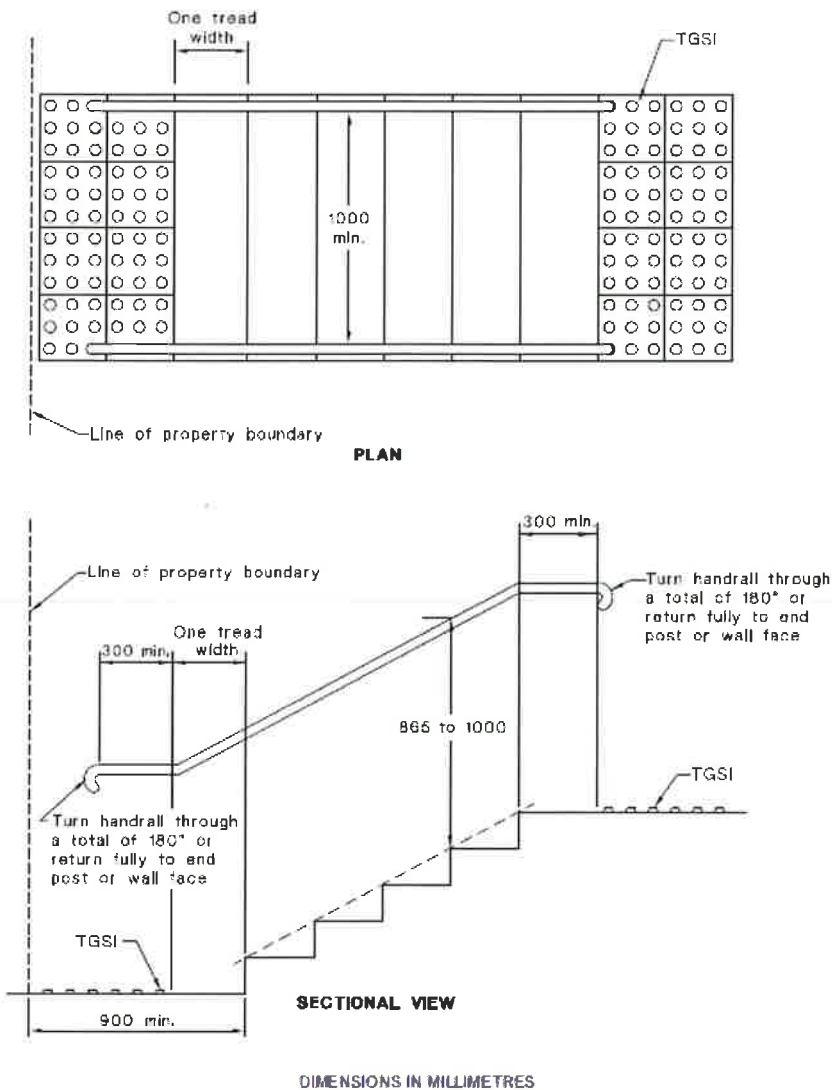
(A) STAIRWAY LOCATION AND HANDRAIL EXTENSIONS AT BOUNDARY
